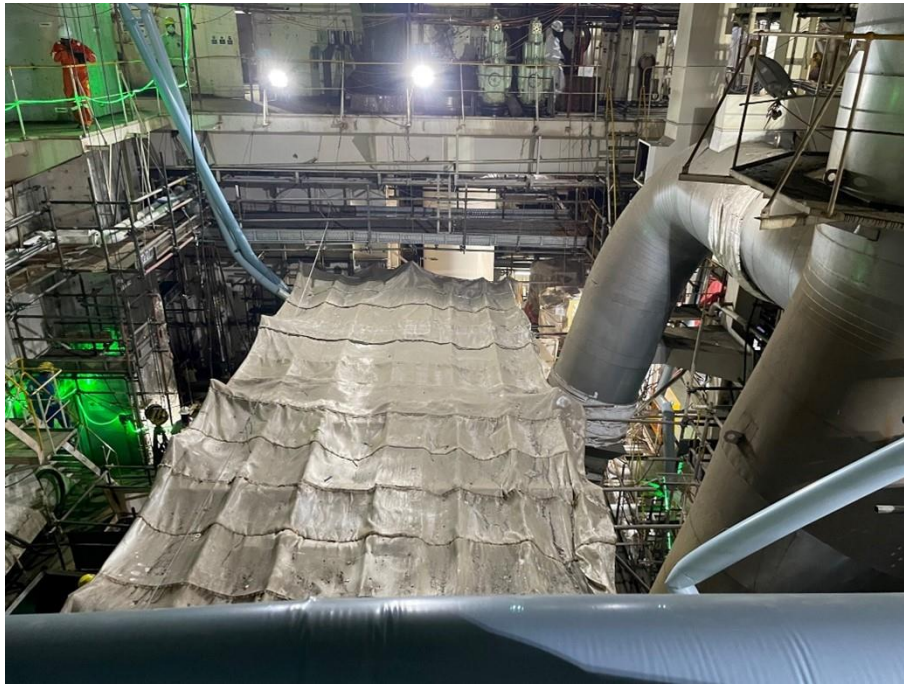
View inside the engine room showing the hole in the deck used to lower down all equipment and that will be closed in the coming days.
